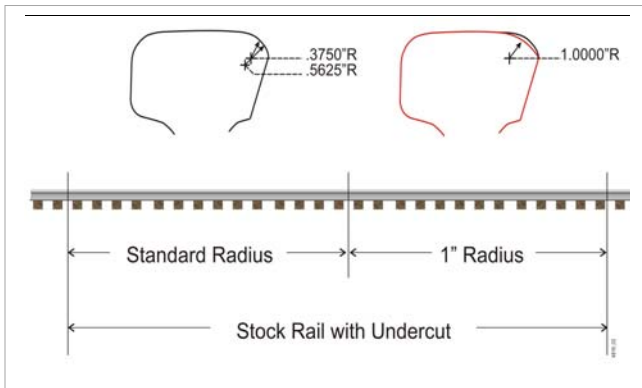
Standard and Proposed Gage Corner Radius on a Test Stock Rail
